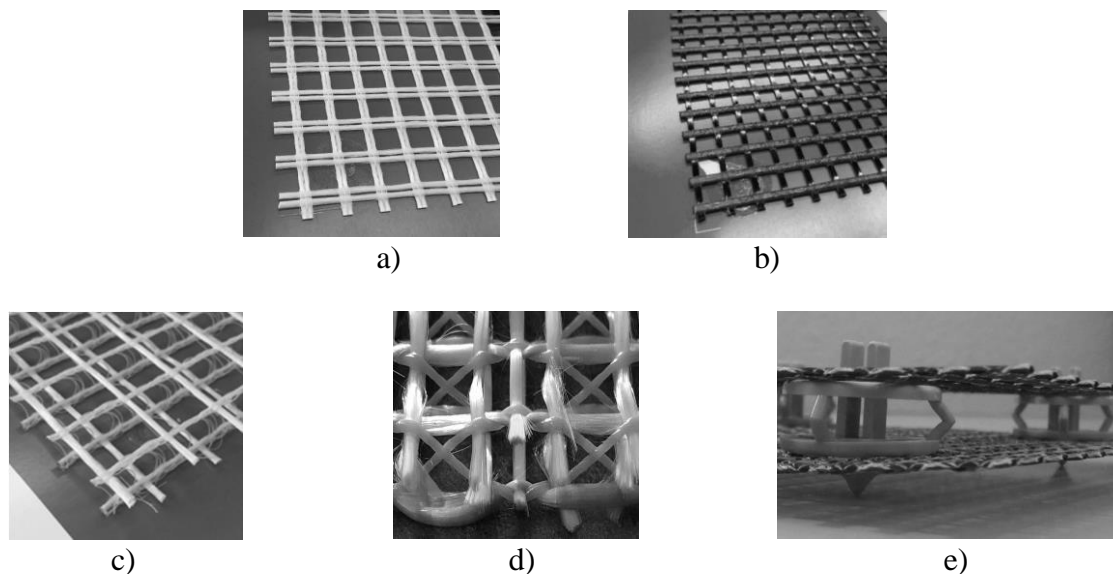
a) planar 2D glass textile, b) planar 2D carbon textile, c) 3D knitted textile, d) 3D woven textile and e) 3D discretely connected textile
